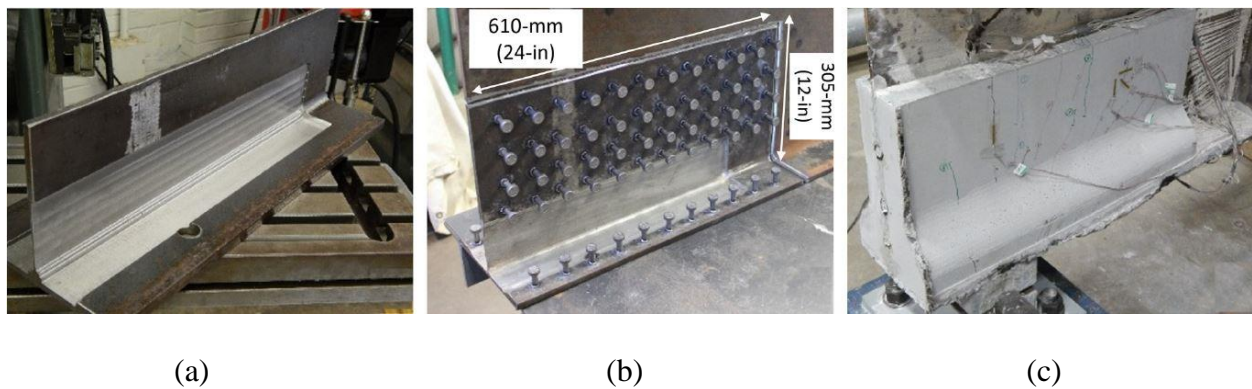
Uniform section loss applied to the girder, (b) welded stud arrangement on the repaired girder, and (c) UHPC repair panel (Zmetra, 2017)
